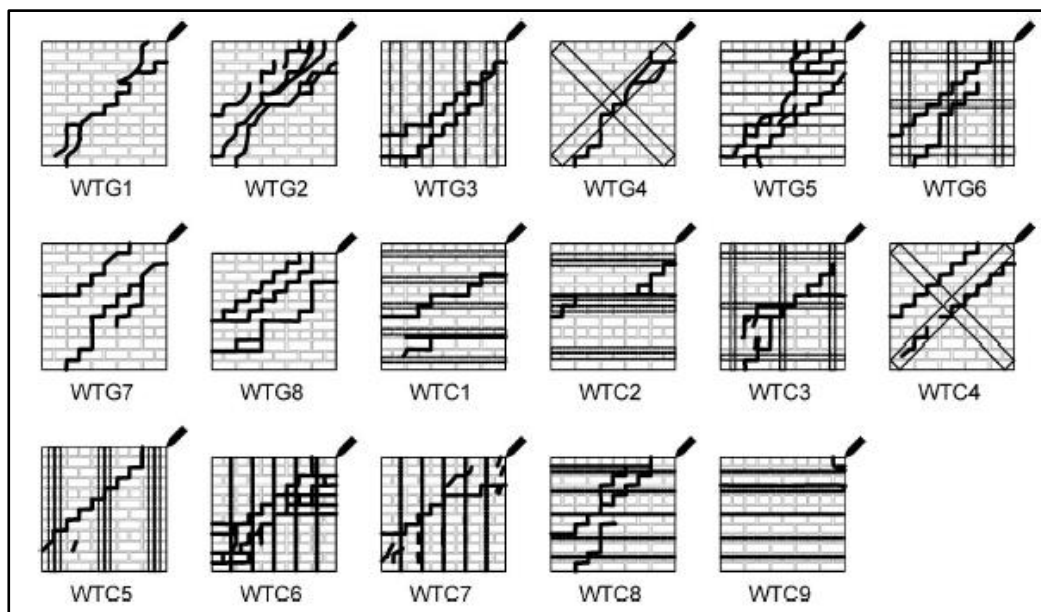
cracking patterns of FRP-retrofitted walls [51]
